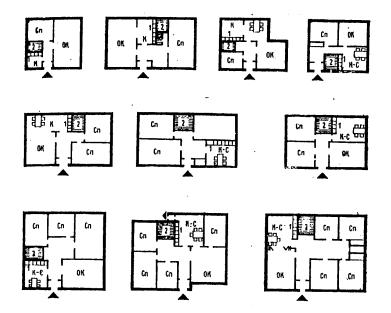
Layout of single-story, single-apartment residential houses. 1-Kitchen equipment; 2--sanitary facility; OK--living room; Cn--bedroom; K--kitchen; K-C--kitchen-dining room (the legend also applies
